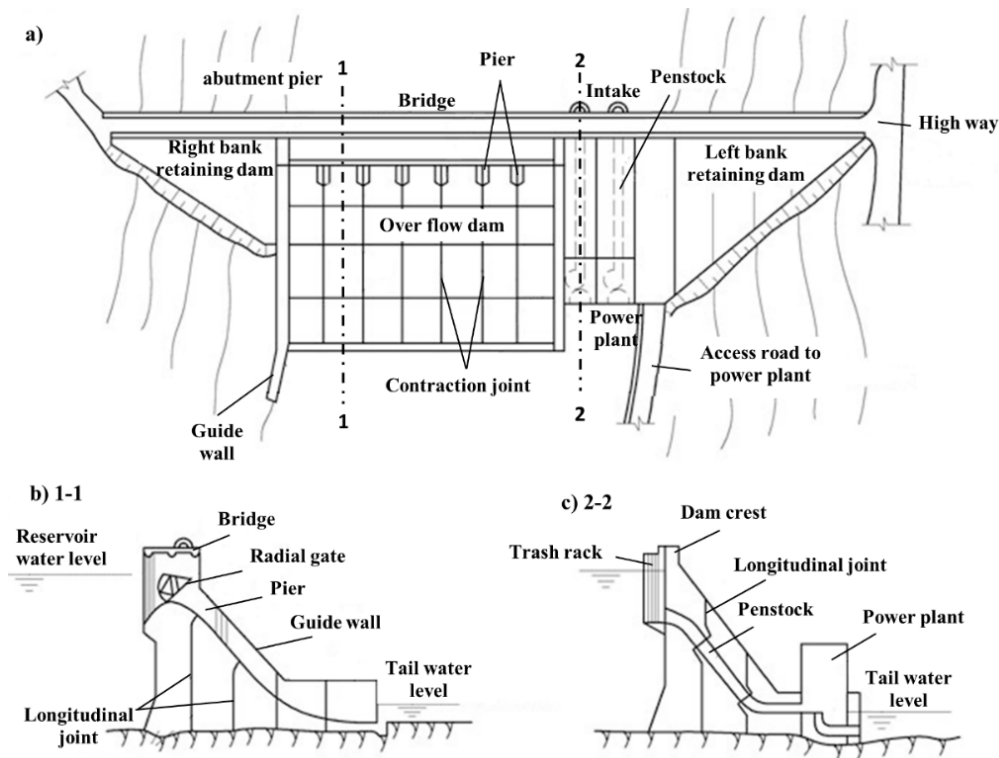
a) Top view of gravity dam; b) Cross section of over flow dam; c) Cross section of power plant.
